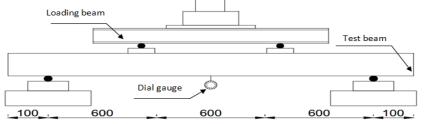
sketch illustrates locations of points loading and dial gauge (All dimensions in millimeter)
